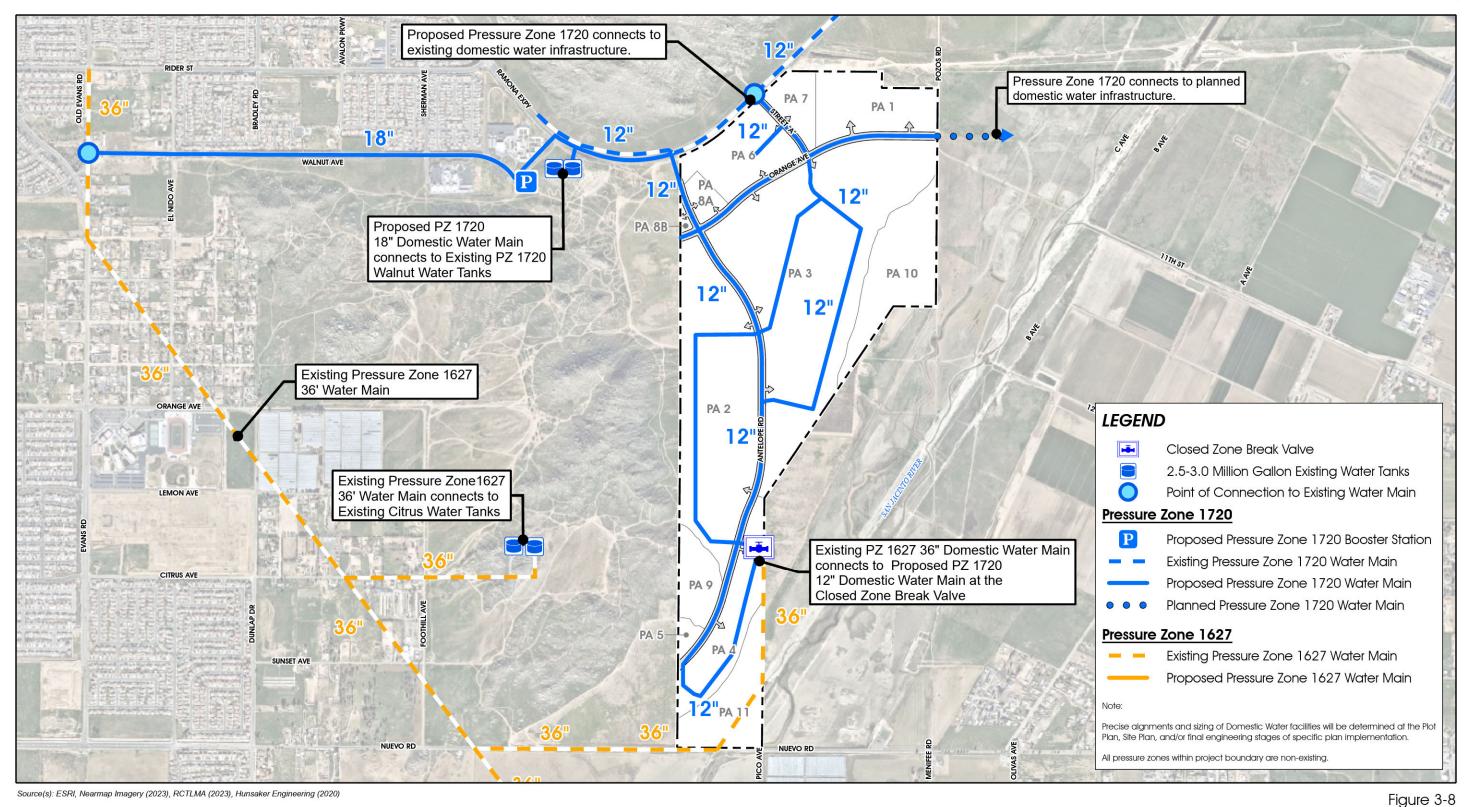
, Conceptual Domestic Water Plan, depicts the existing and proposed water facilities in the area. It should be noted that the planned improvements depicted on Figure 3-8 generally would not change if the Mid-County Parkway (MCP) is constructed through the Project site. As shown, the Project site is served by EMWD in the 1720 Pressure Zone. The Project Applicant would construct the following facilities as necessary to serve the Project site with potable water: proposed on-site and off-site water mains within roadways, two (2) proposed 2.5-3.0 MG water tanks located off-site approximately 0.3 mile to the west of the Project site, a proposed booster station located approximately 500 feet west of the Project site.
